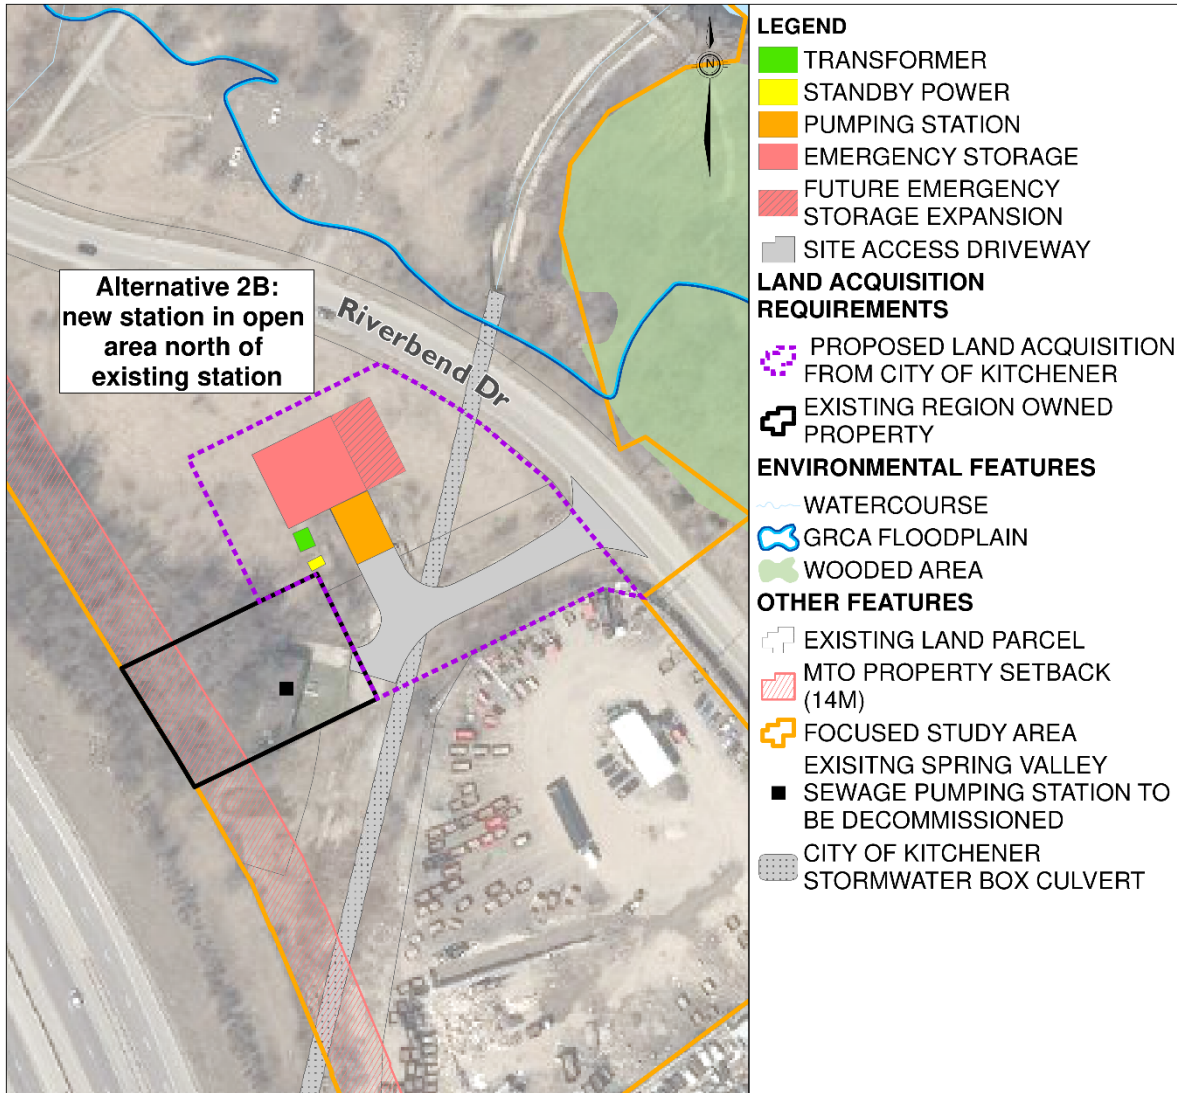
Alternative 2B: New Station in Open Area North of Existing Station
